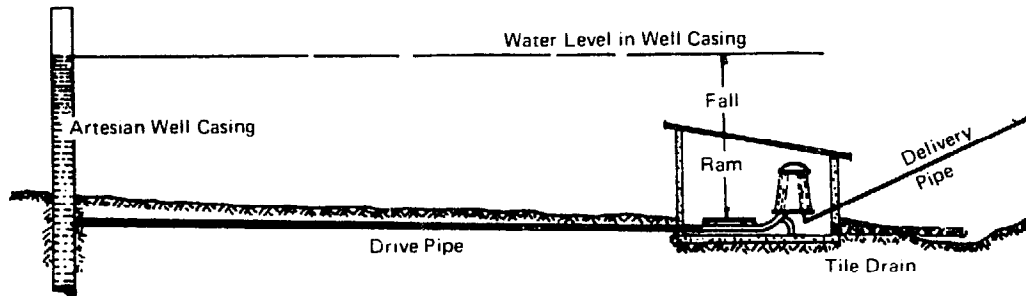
Hydraulic ram and examples of typical installations. [Courtesy Rife Hydraulic Engine Manufacturing Co.]
